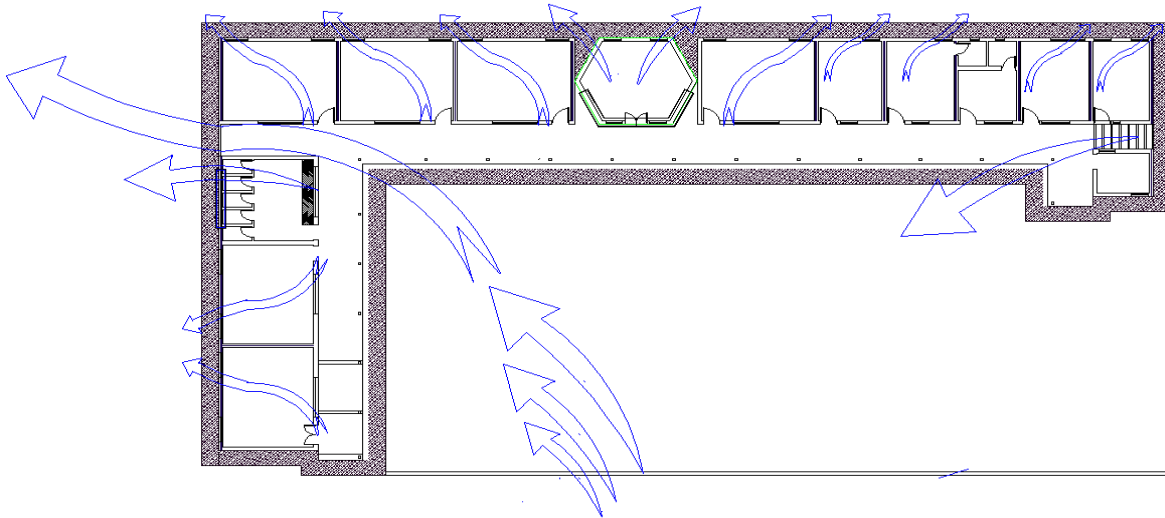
Natural and cross ventilation phenomenon in buildings.
